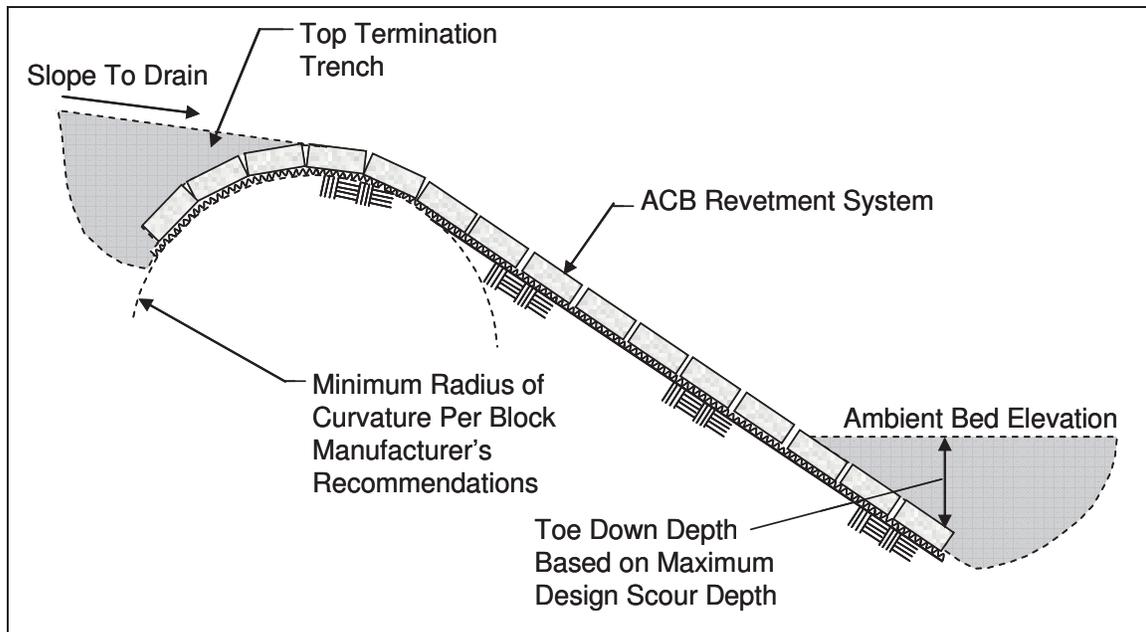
Recommended layout detail for bank revetment where no bed armor is required.
